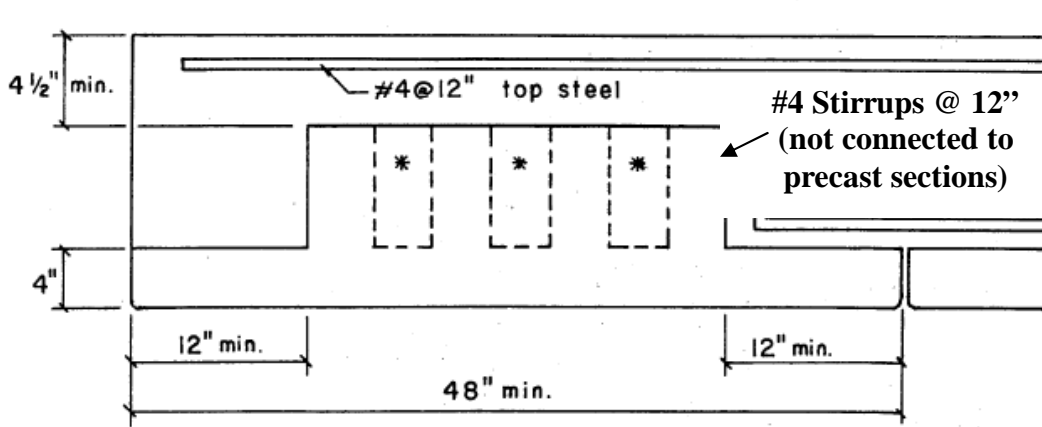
Cross section of the panel detail recommended by Hays, Jr. et al. (1980)
